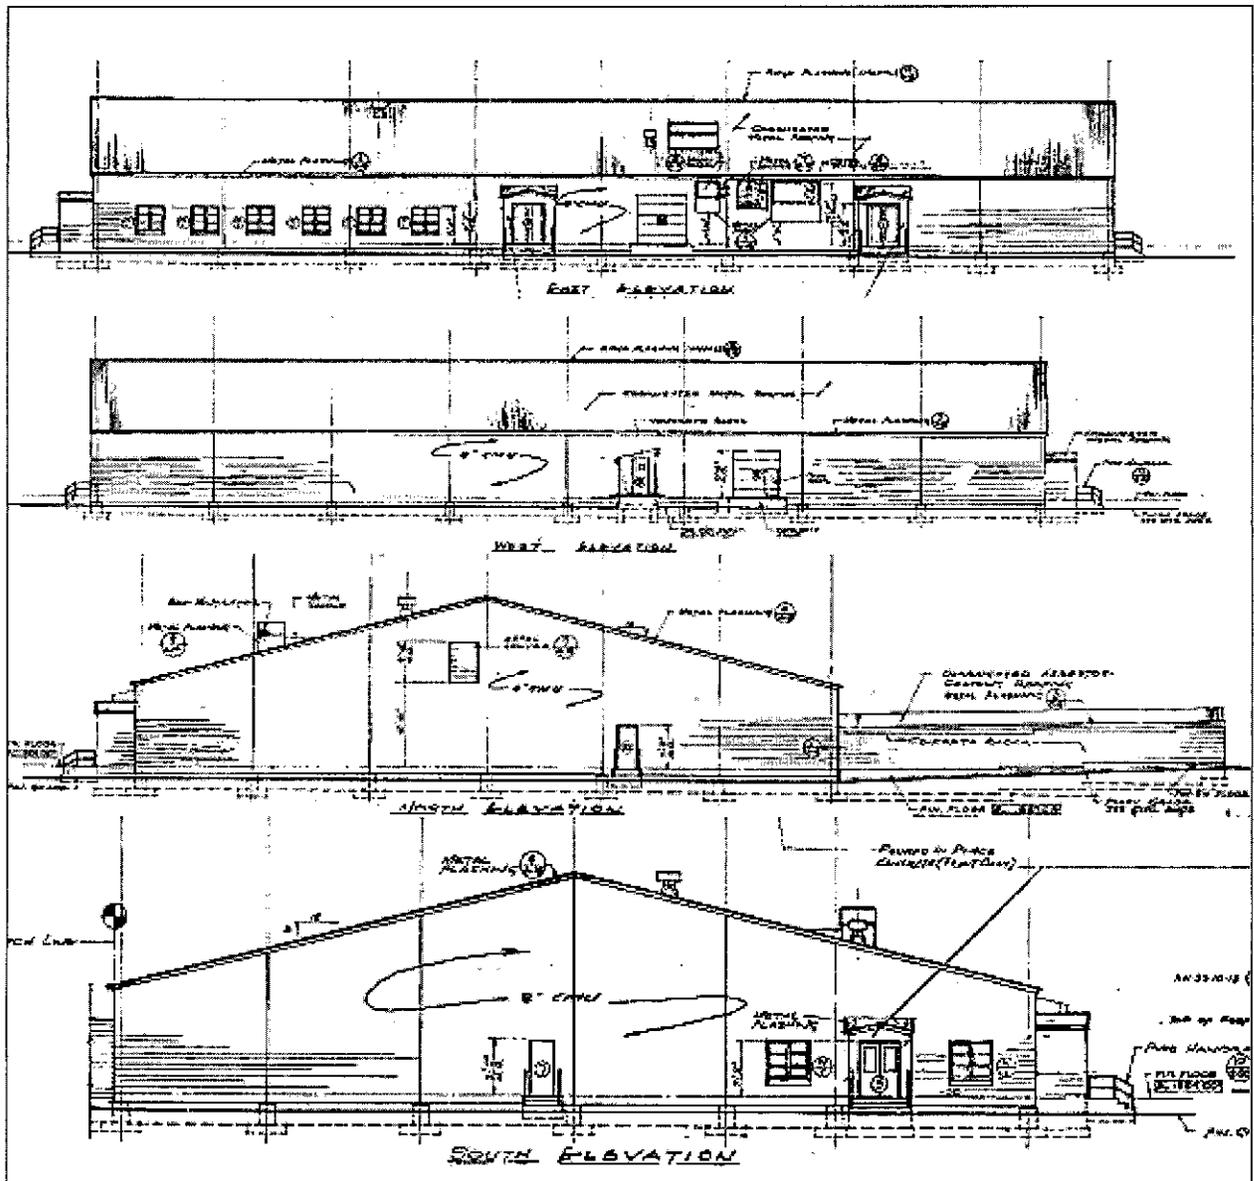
ADA Bldg architectural elevations As-built AW-30-05-08. See Appendix C for expanded version.
